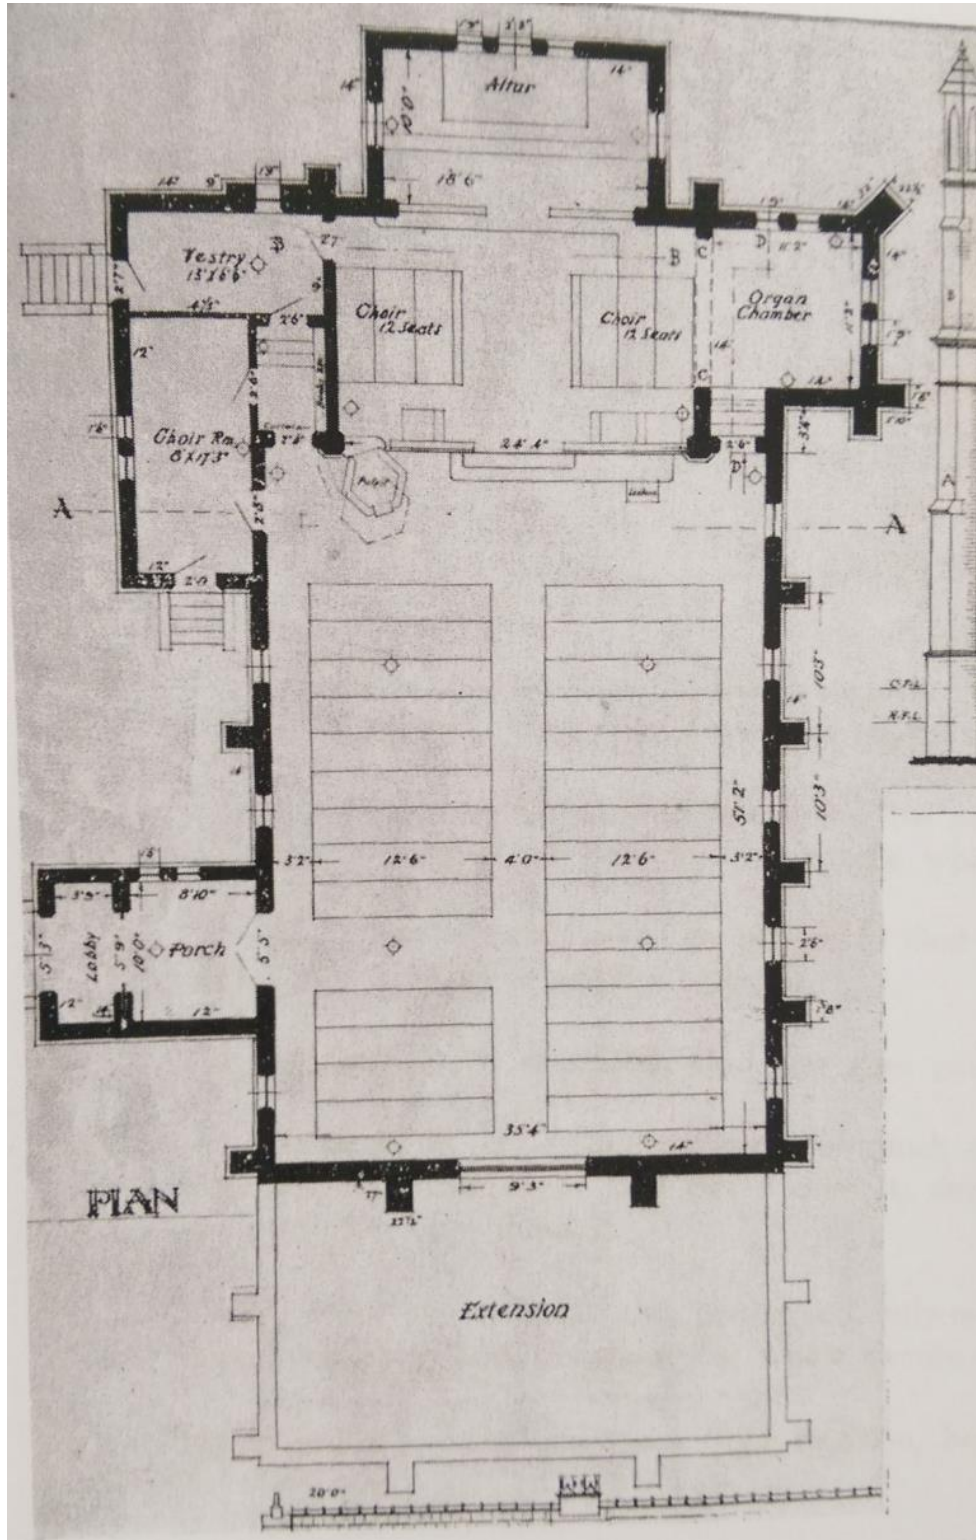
The floorplan of St Andrew's Church. It is assumed that the drawing is a copy of the original plans drawn by architect, John Routly, but this has not been verified (photograph of a copy, courtesy St Andrew's Church personal records).
